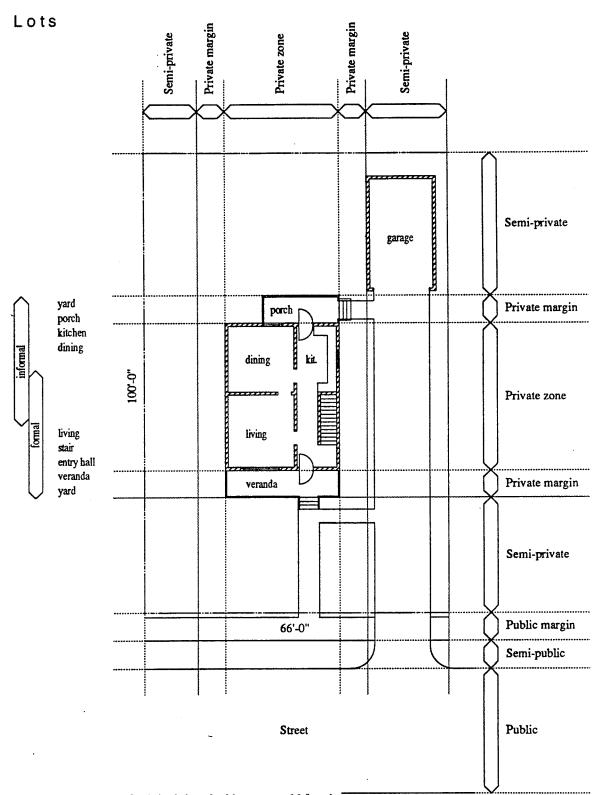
Floor plan of original detached homes on 66 foot lot.
